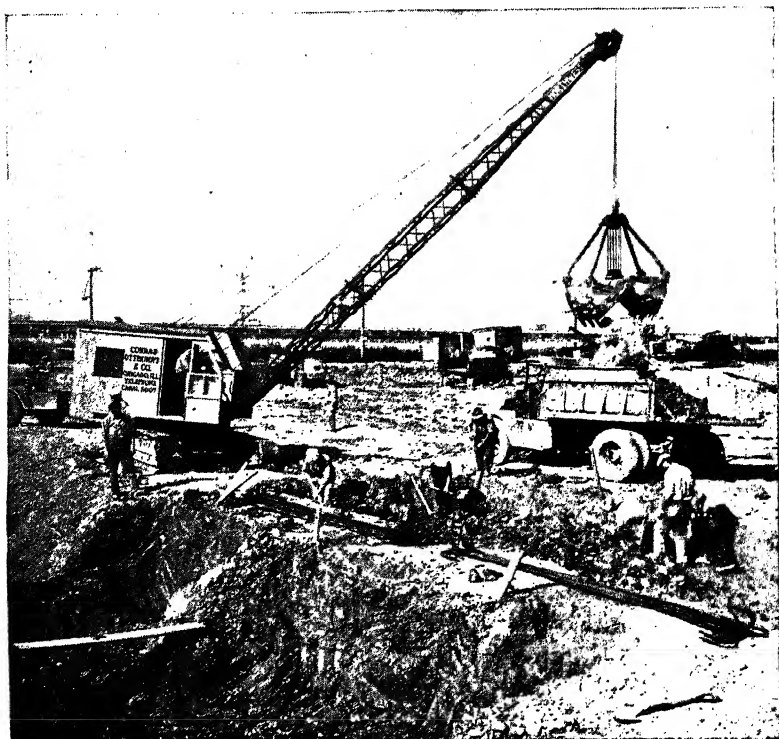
Clamshell bucket in trench excavation. (Courtesy of Northwest Engineering Company.)
